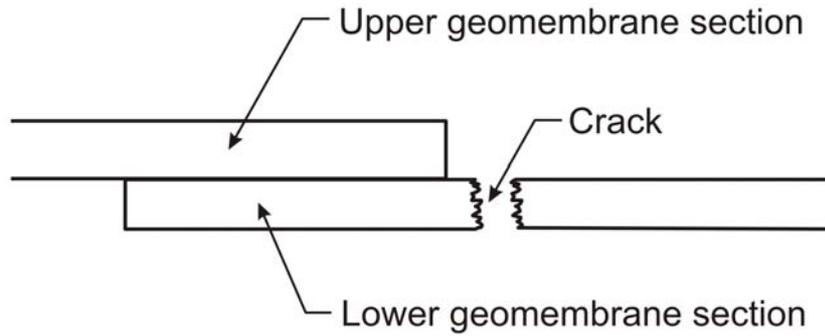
Cross section of the geomembrane showing the crack located next to a seam, in the lower geomembrane section. (Note: Here, the crack is shown before it got wide open due to thermal contraction of the geomembrane.)
